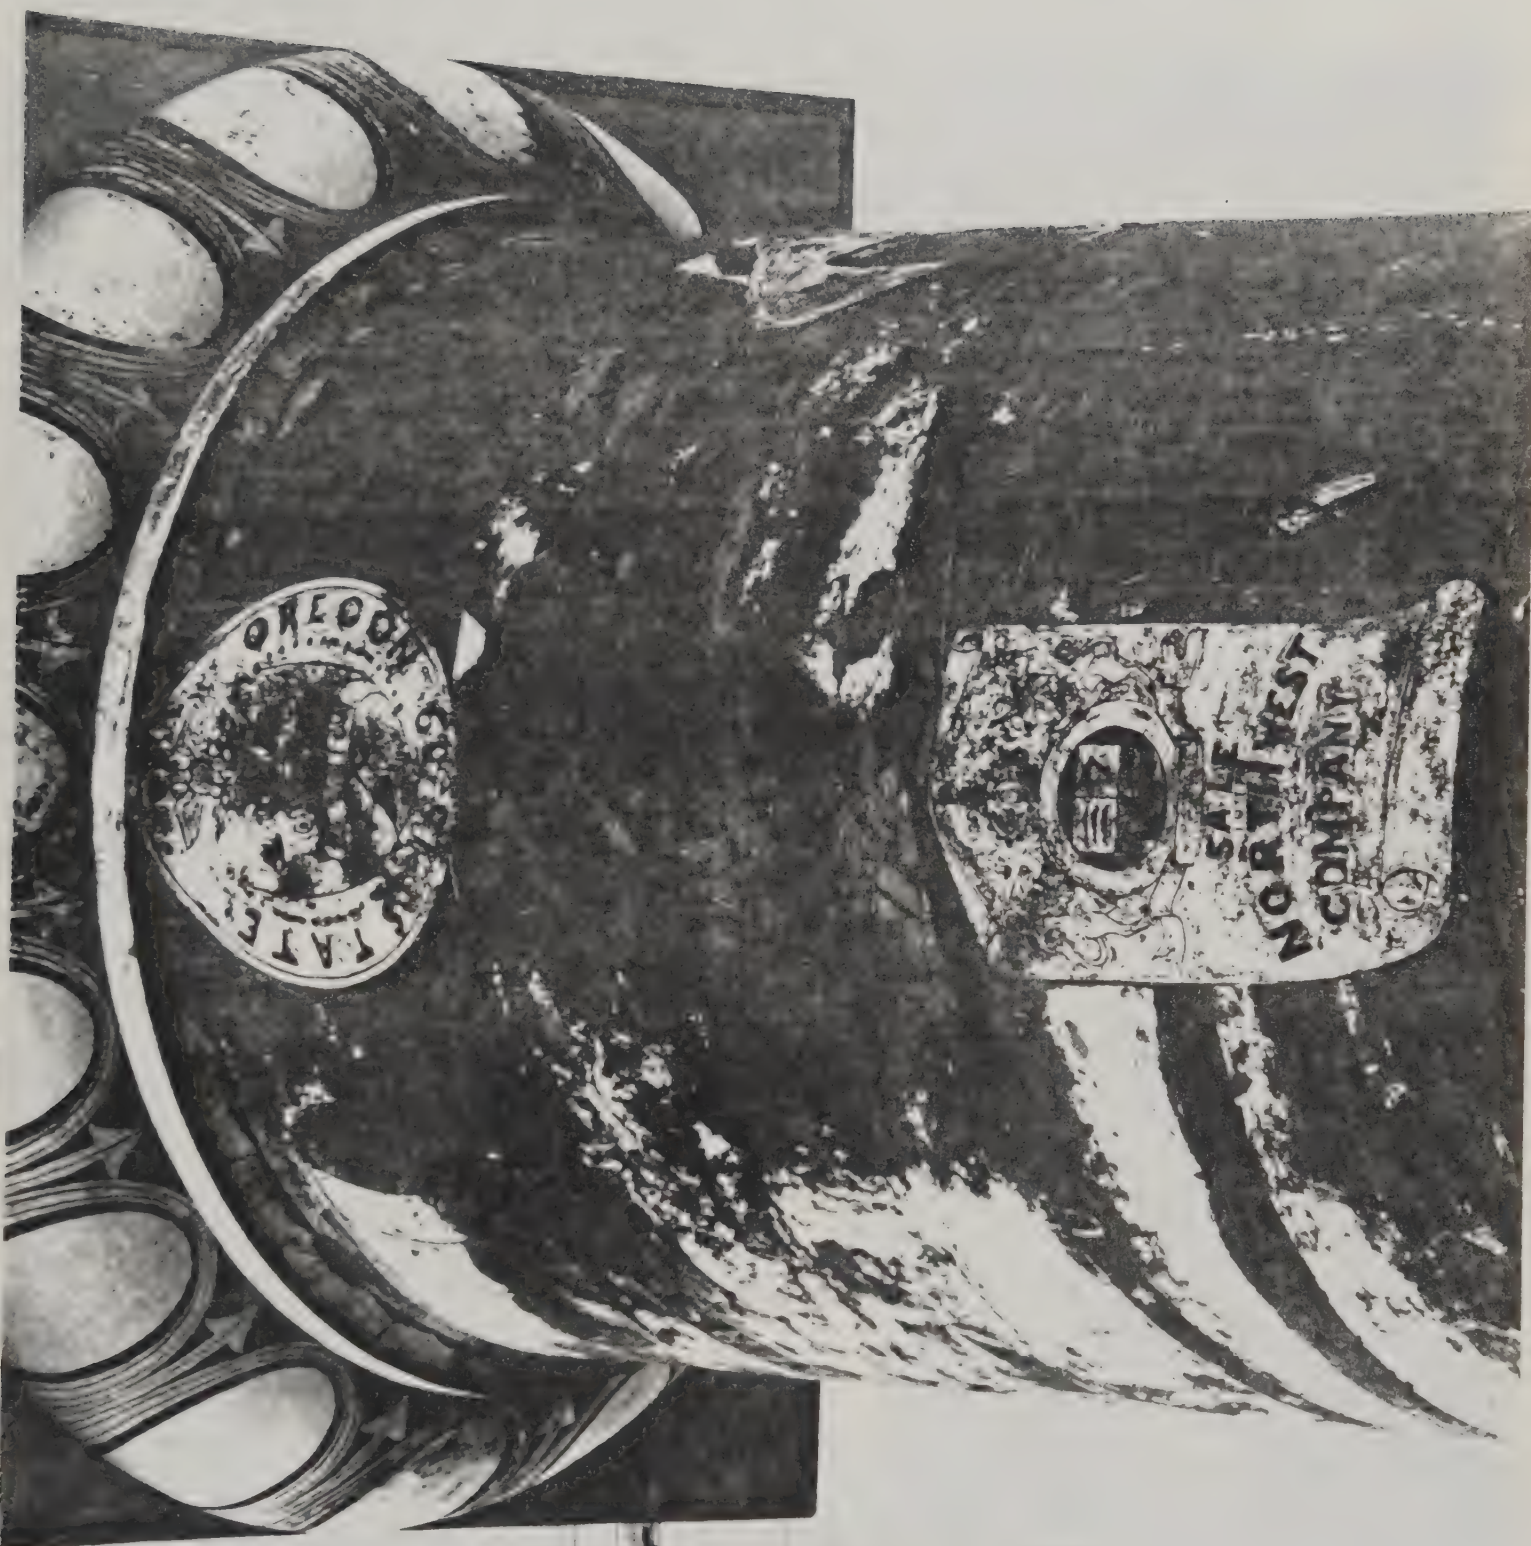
Photo Astoria Column South Face Section-OCT 1989
